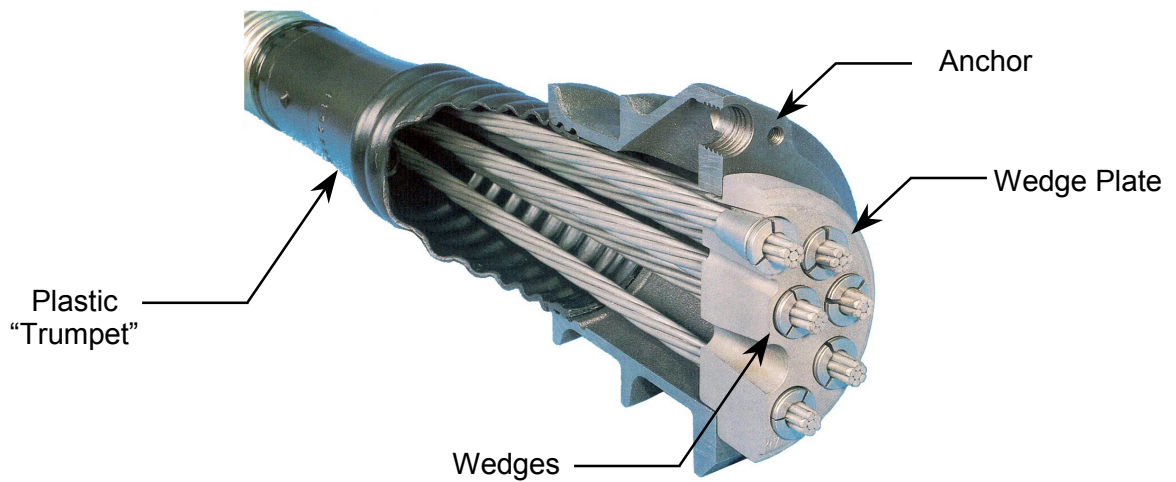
Details of the anchorage system used in the Niles Channel and Mid Bay Bridges.
